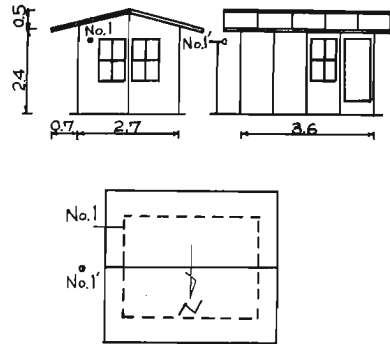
(b) The dimension of actual House B and the position of pressure measuring points.
